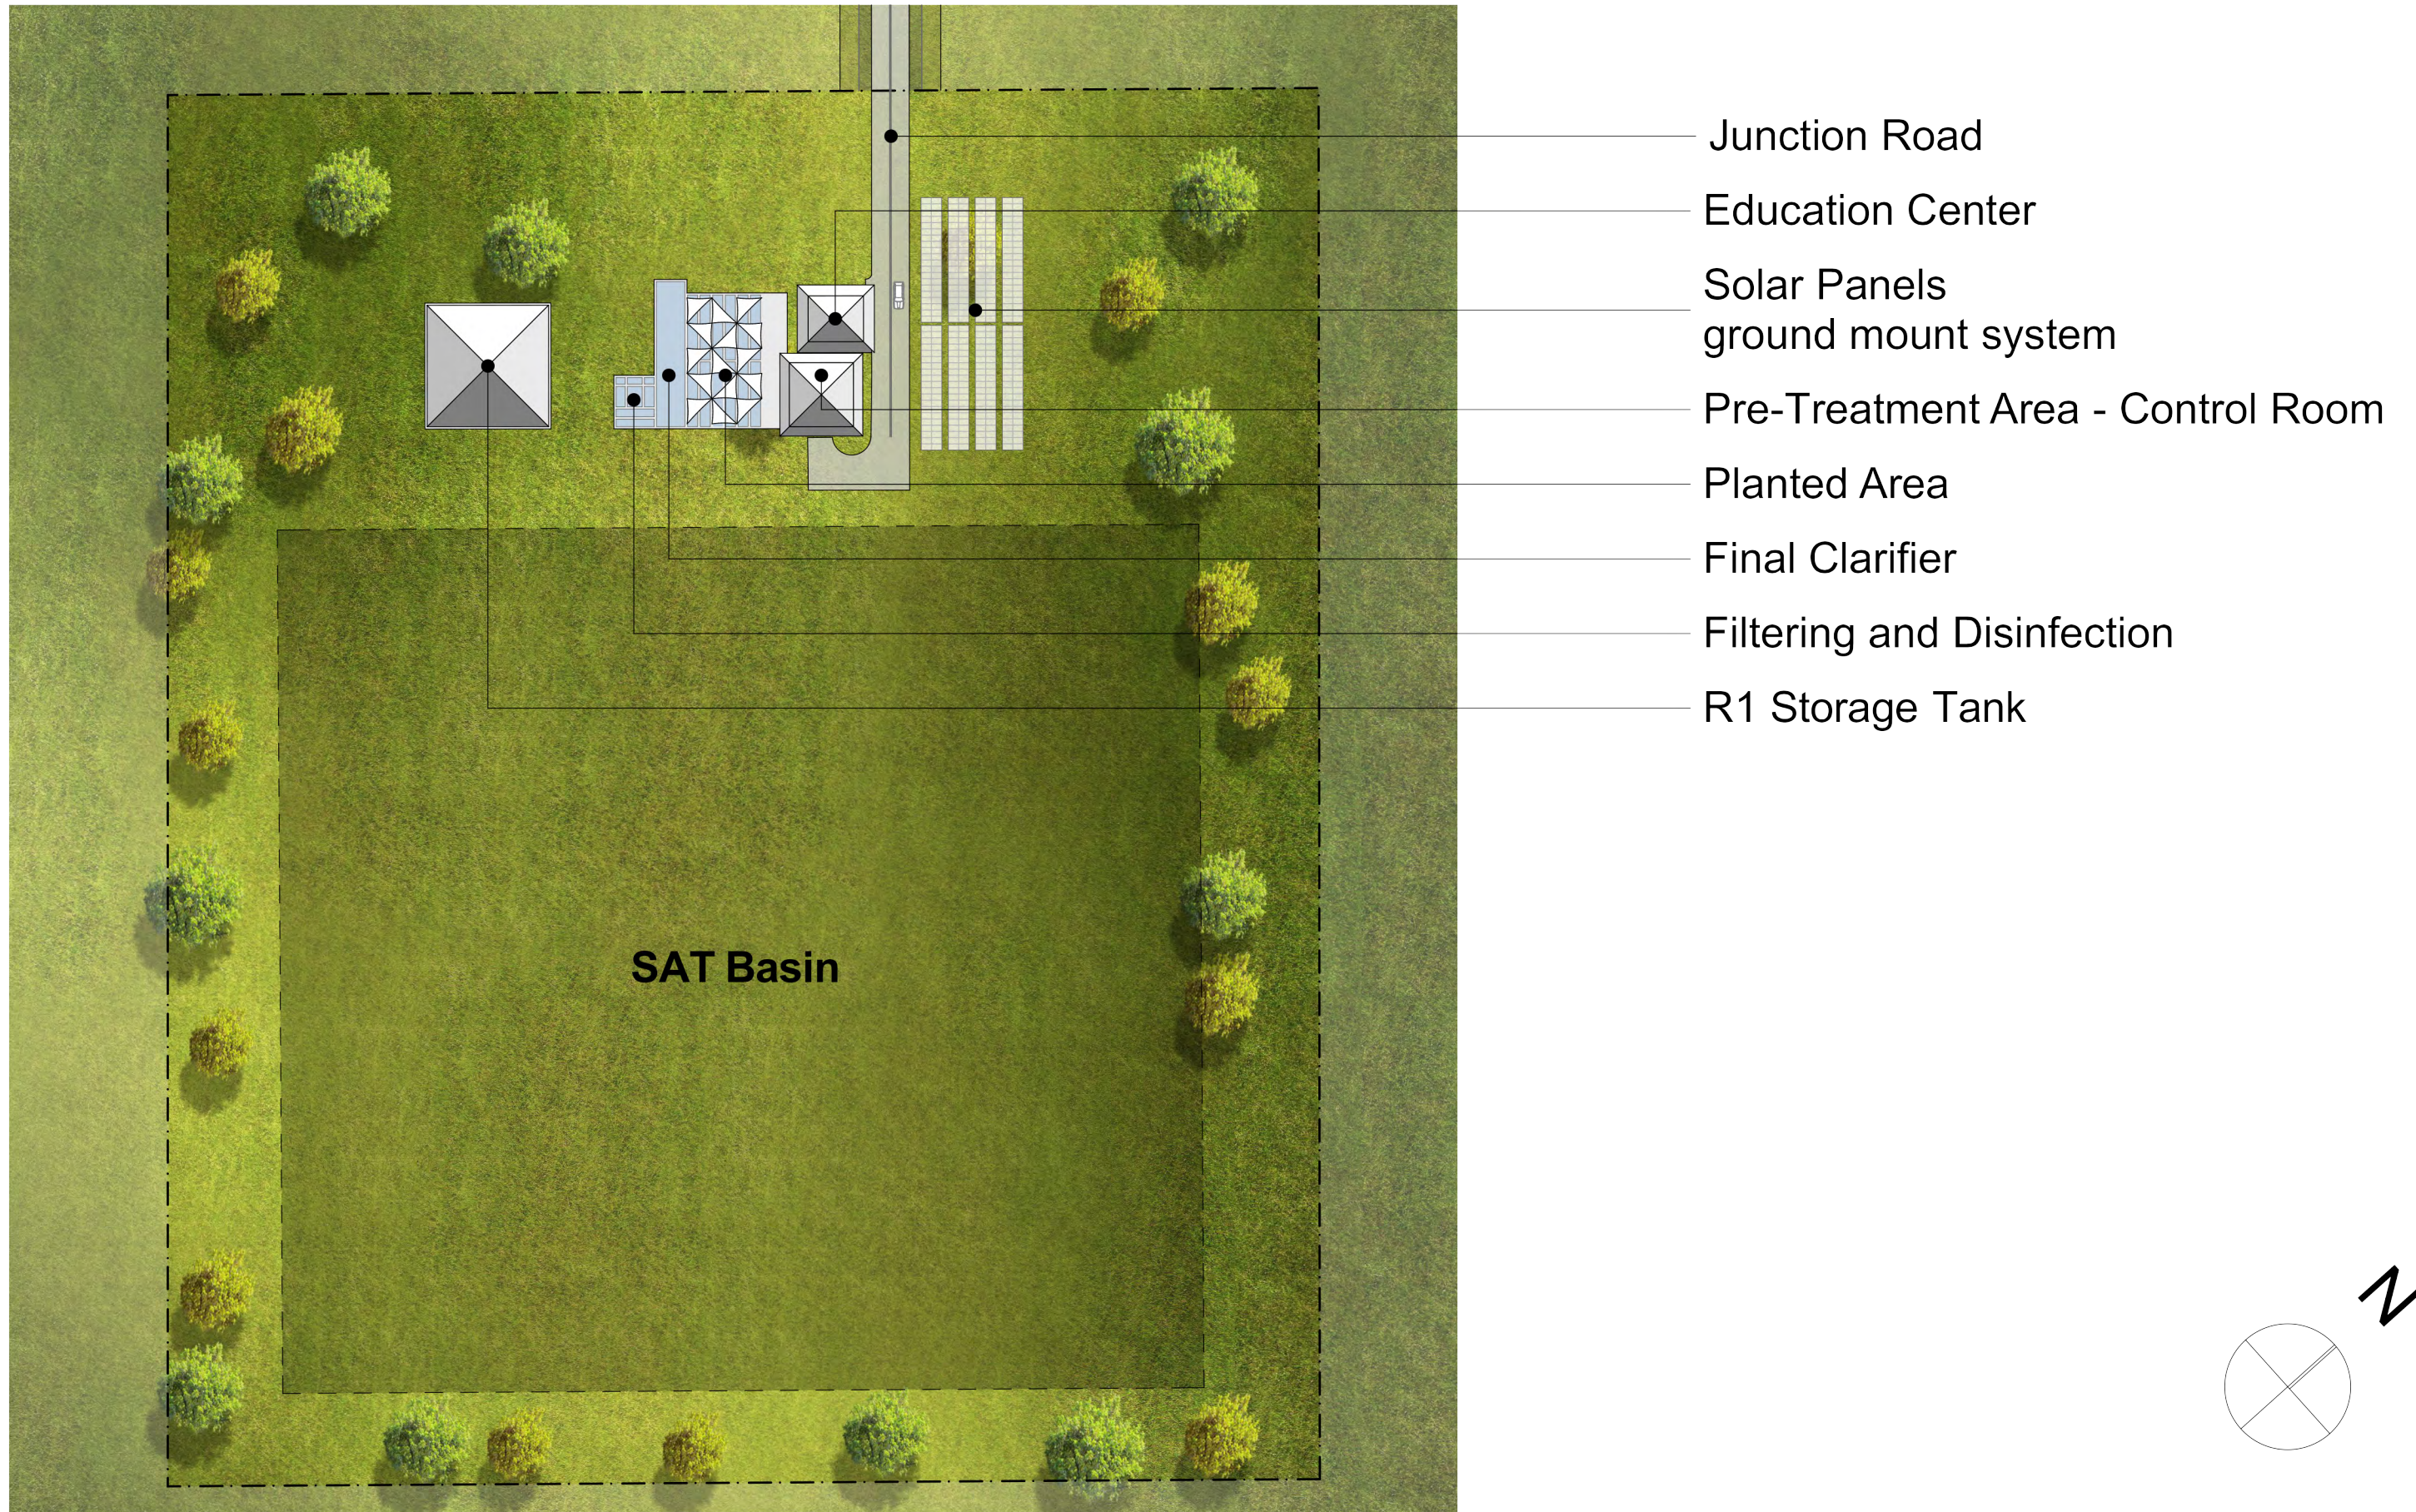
Conceptual WWRF Site Plan Proposal - 4
